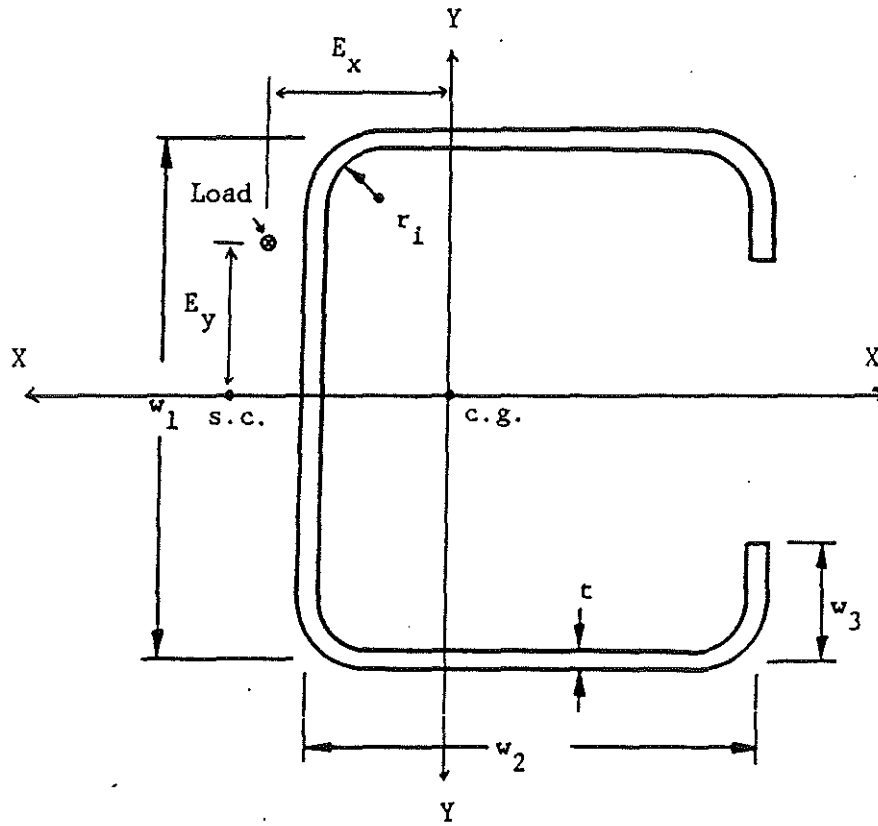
Cross Section of Lipped Channels for Beam-Column Tests
